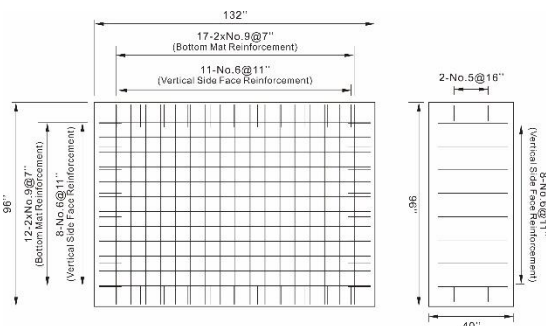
Details of II-7 footing specimen (FHWA/TX-21/0-6953-R1)
